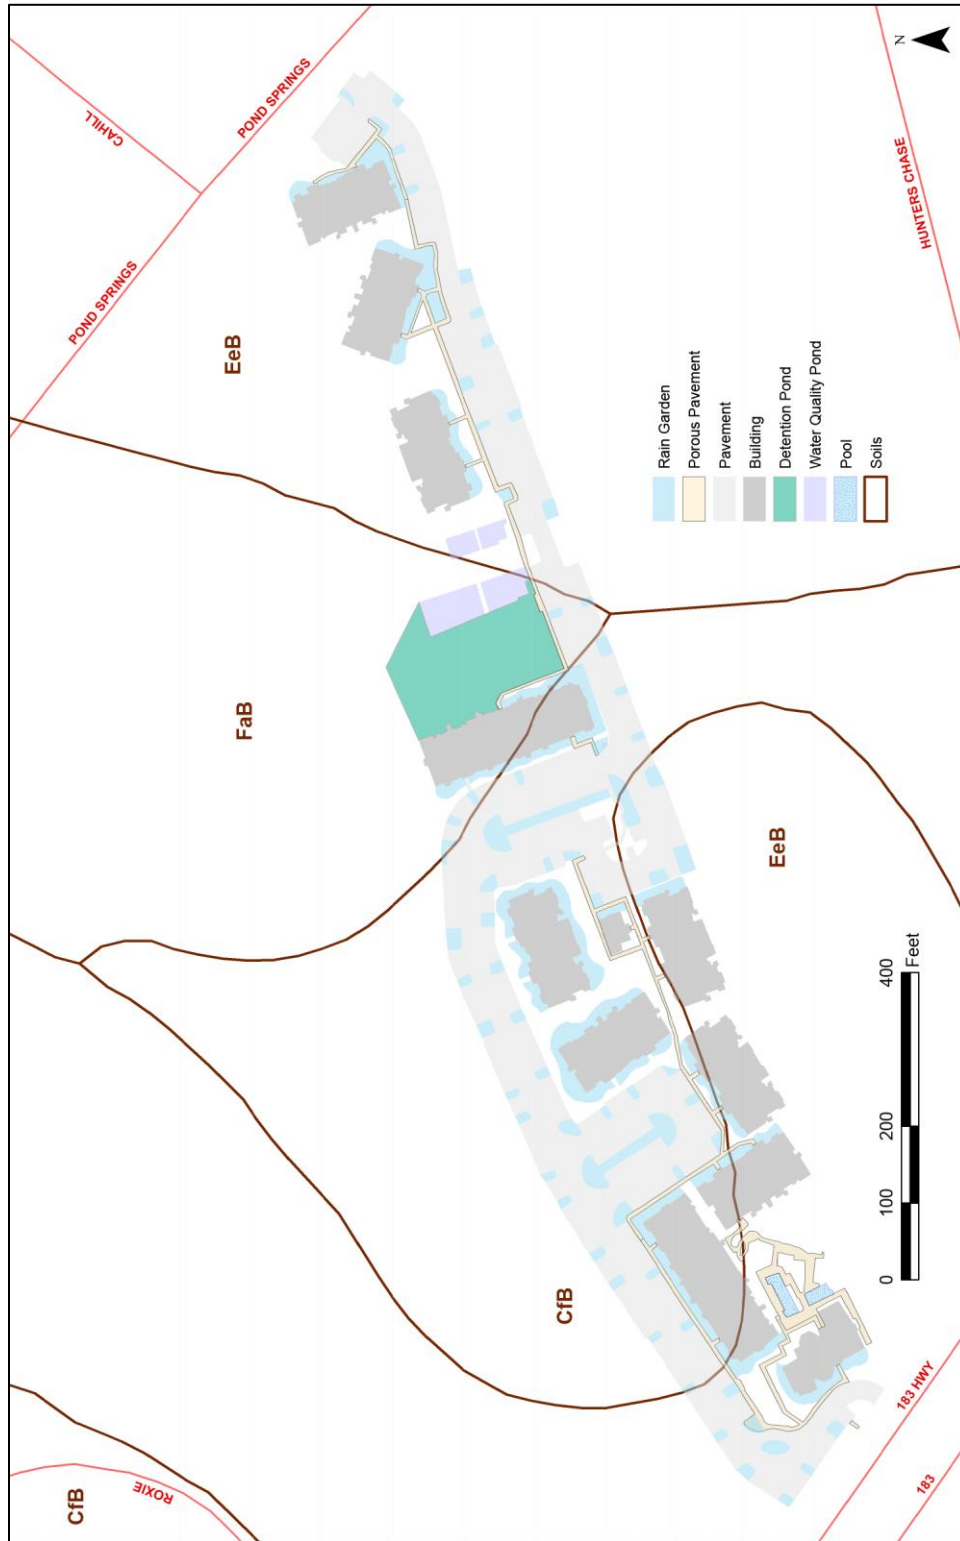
Layout of GSCMs Under Ideal Site Conditions for the Balcones Ranch Apartments
